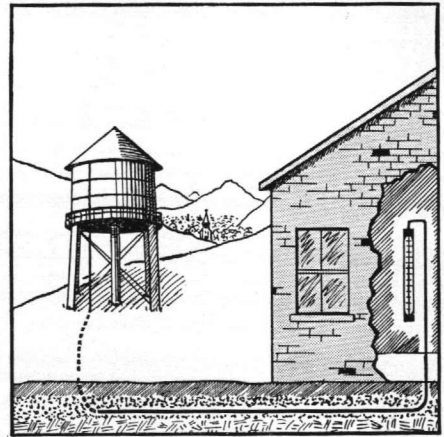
Typical water tower installation with connections to Tank-O-Meter buried.
